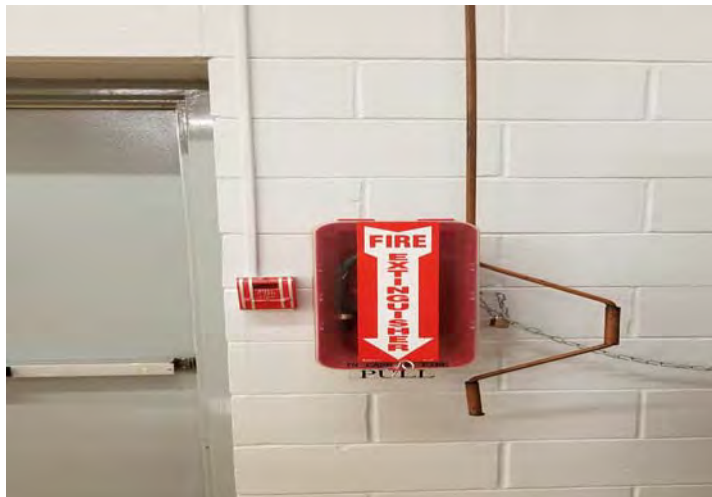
PHOTO OF FIRE EXTINGUISHER (IN THE GYM)
